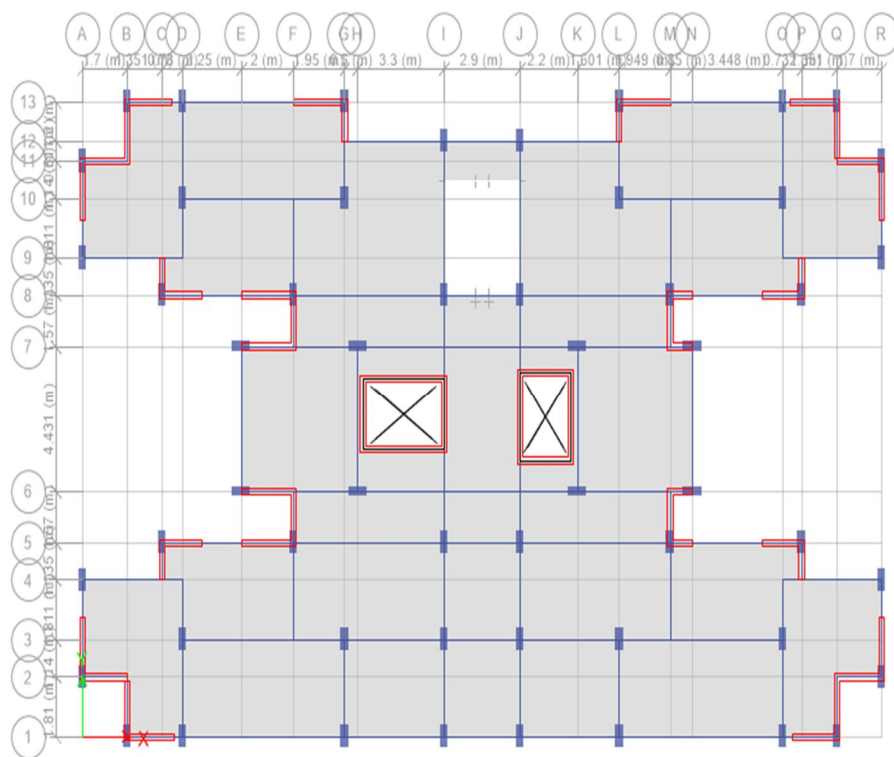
Model 5, plan with inside and outside corner shear walls and core walls
